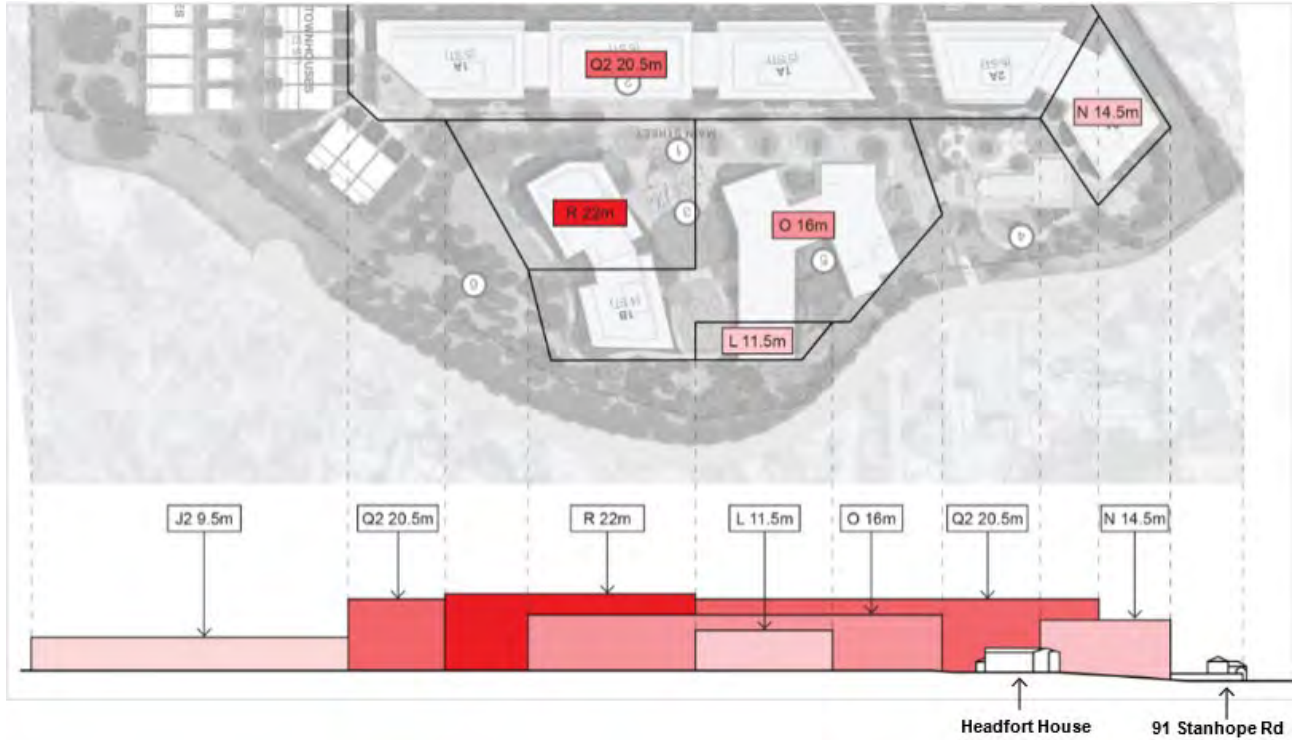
Building Envelope - elevation to Stanhope Rd – proposed excessive bulk and scale presentation to Stanhope Rd, to Headfort House setting and to 91 Stanhope St.
